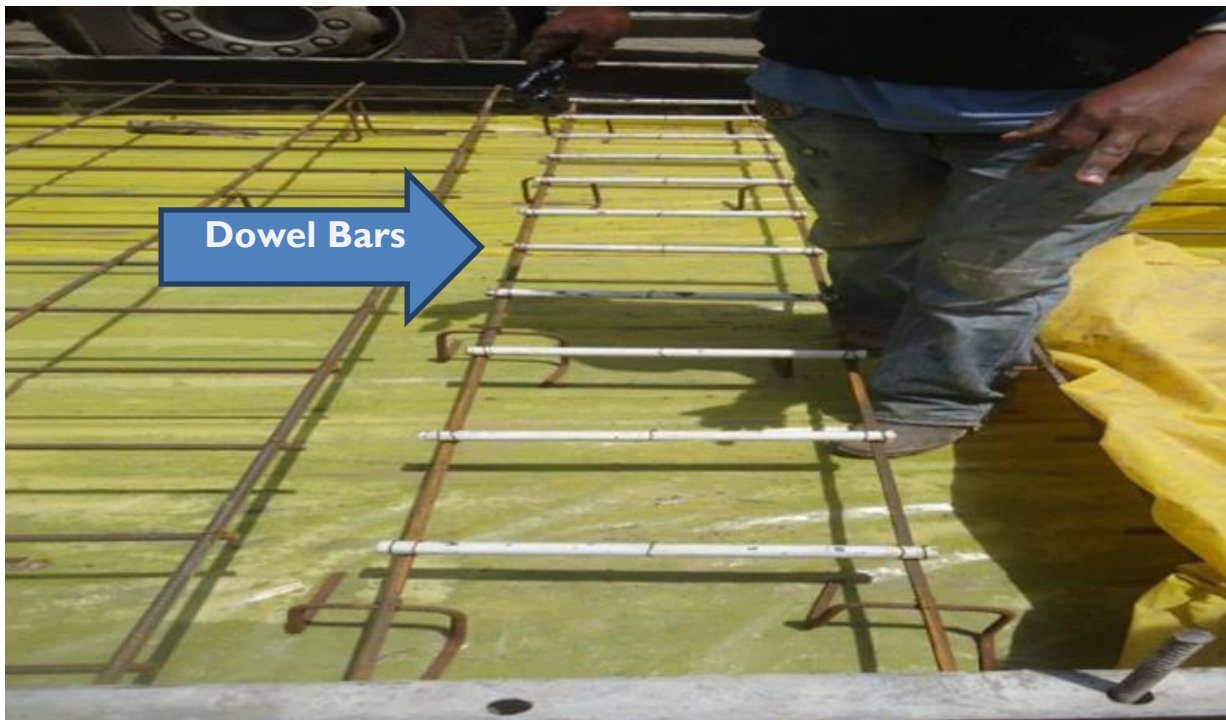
Dowel bars at joints for concrete pavement (from Chancho-Derba Project)
